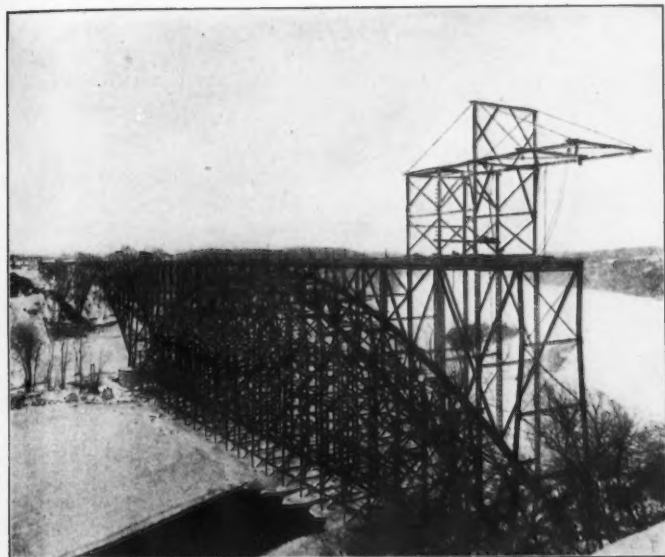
THE ERECTION OF THE LAKE STREET BRIDGE, OVER THE MISSISSIPPI RIVER,
